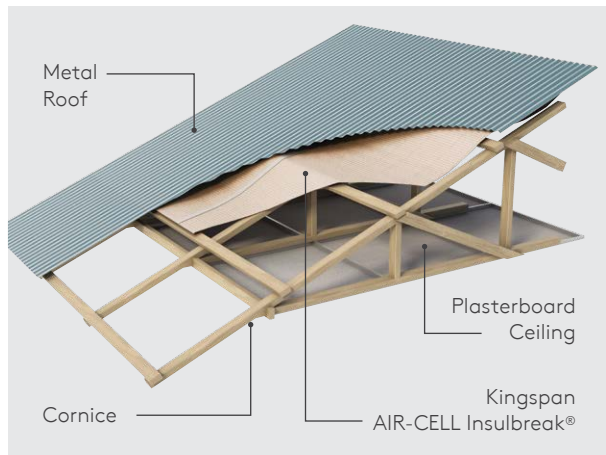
Kingspan AIR-CELL Insulbreak® 55 in a timber framed metal roof sheet, with an attic space and flat ceiling.
